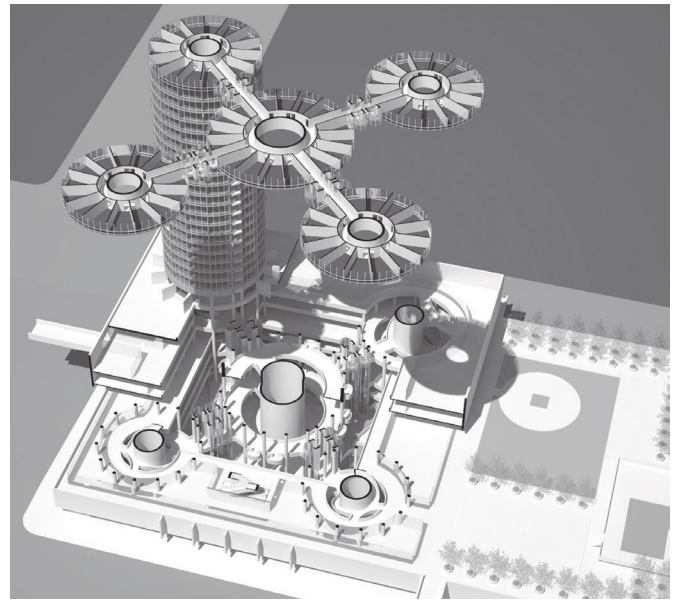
3D-section. A typical hotel storey containing seventy-two rooms served by no less than twelve elevators. The rooms are lifted out of the busy fabric below and the elevators literally lift the guests up through the glass roof—like penetrating a membrane detaching the five towers from the pulsating life below.
